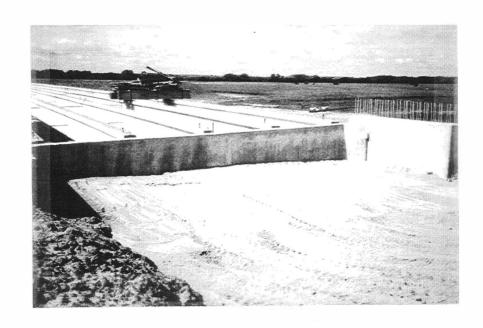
Placement of Granular Backfill for Flooding and Vibrating, North Abutment, Bridge C
